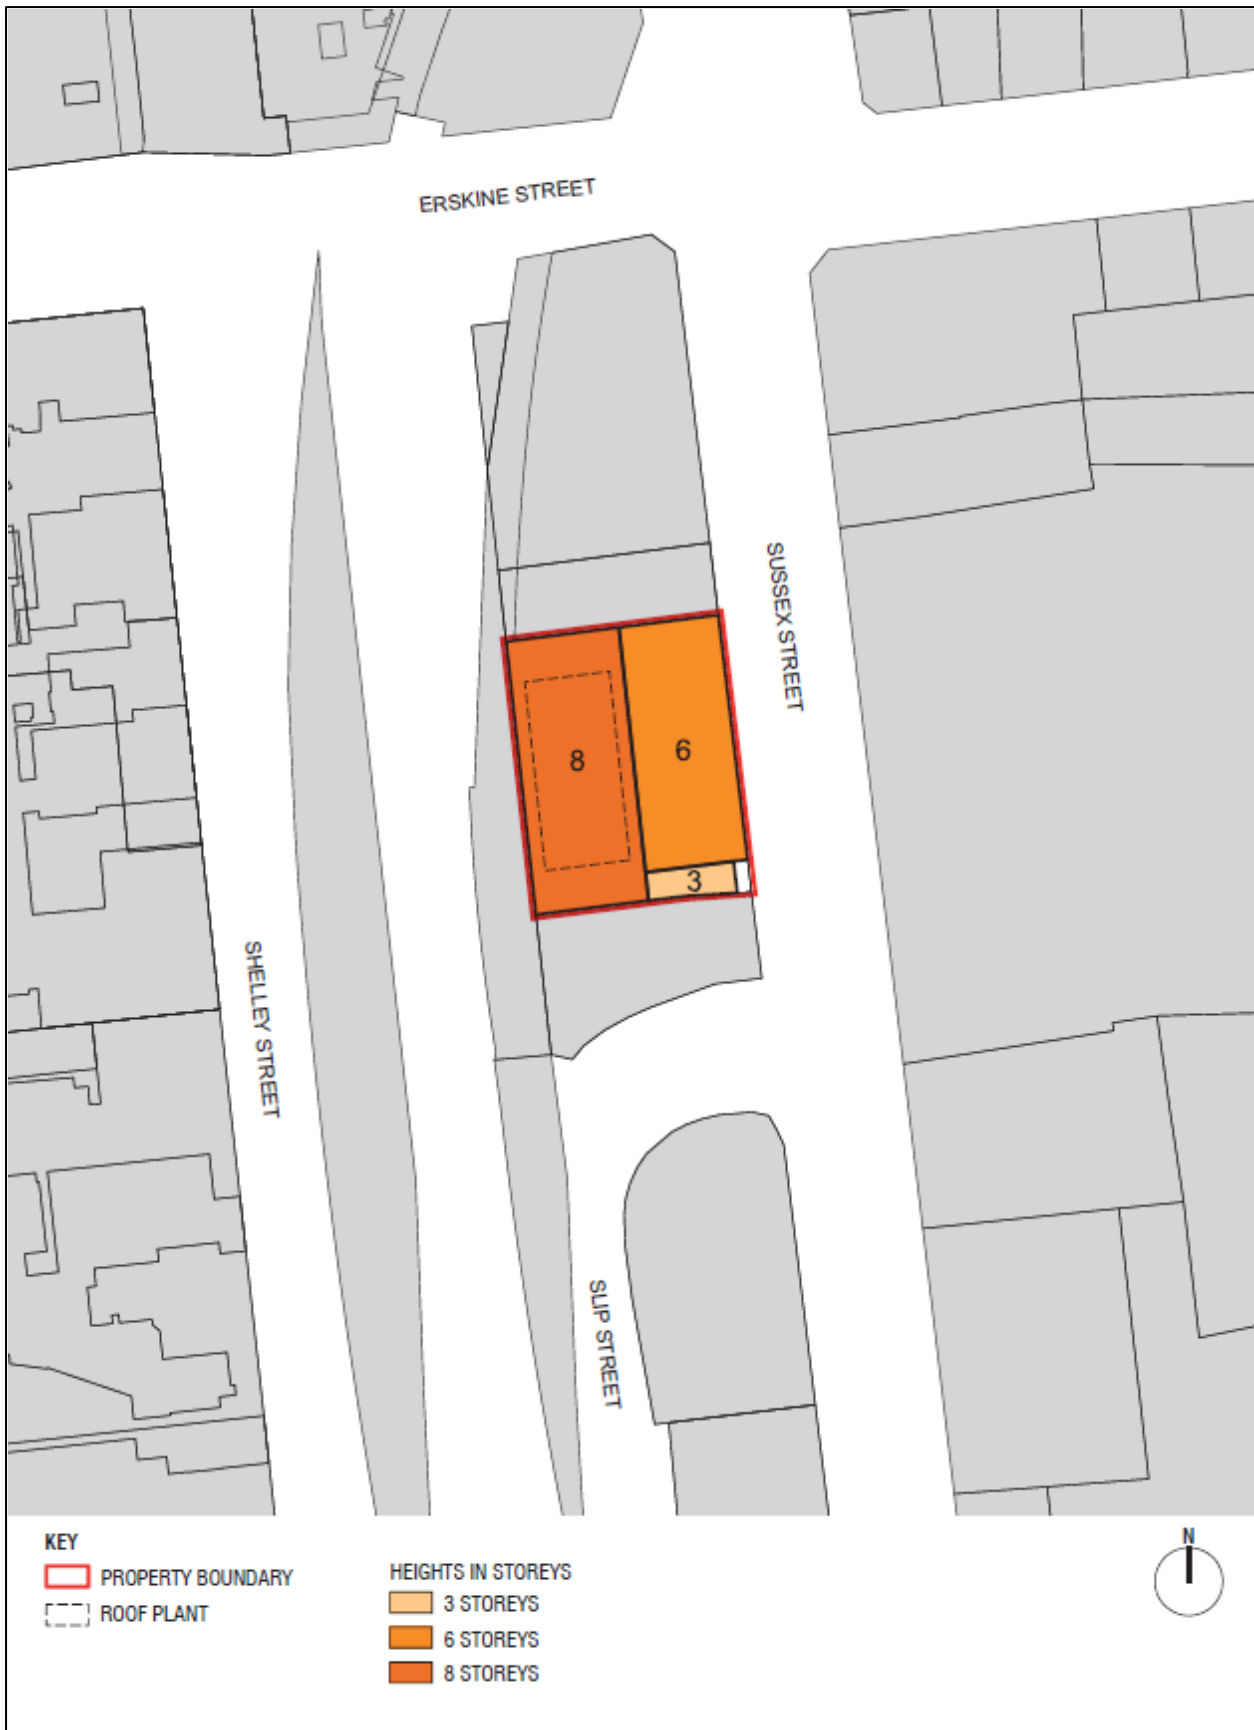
xx: 65-79 Sussex Street – Building height in storeys
